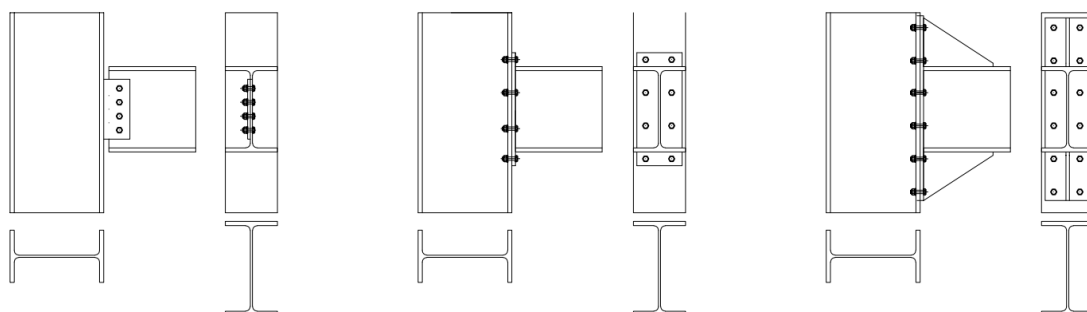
Three types of bolted connections: a hinged connection, a semi-rigid connection and a rigid connection
